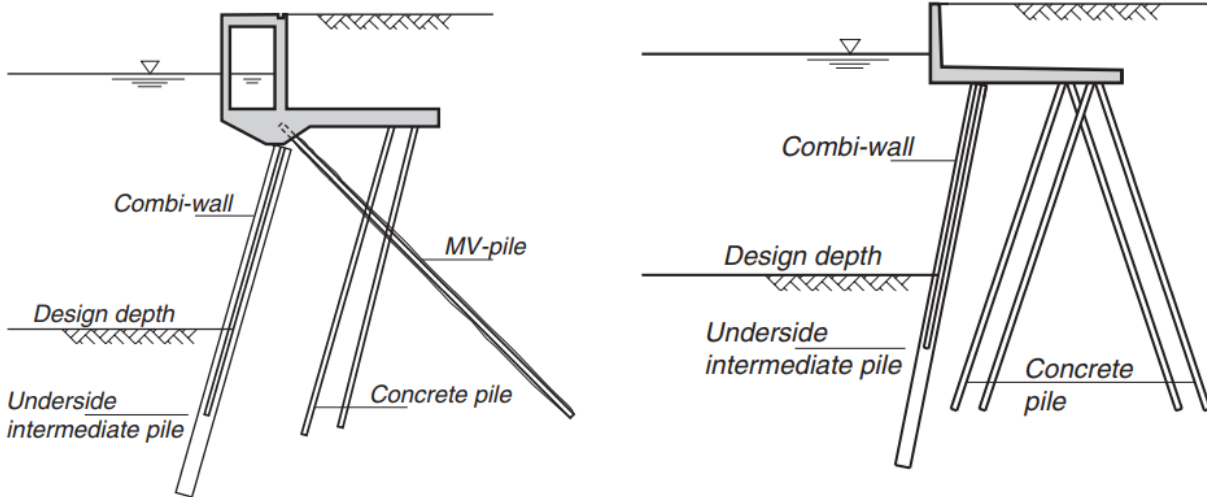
Quay wall with hollow box relieving platform (left) and L-shaped relieving platform (right) [1]
